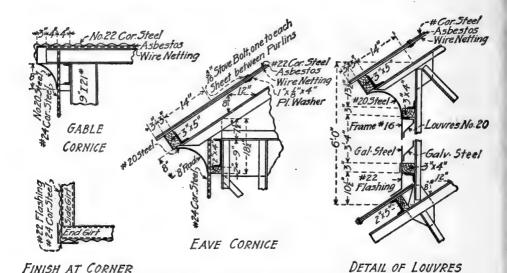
Corrugated Steel List and Details for Transformer Building.
